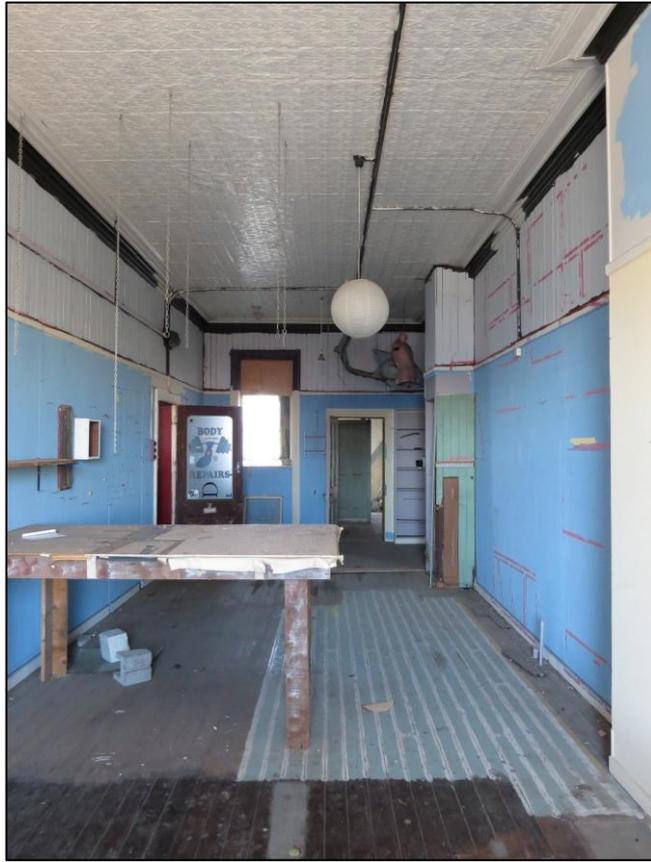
Room 34, first floor, facing east, showing timber floor, range of wall linings, joinery and pressed tin ceiling. Note boarded fireplace on right in immediate foreground. Amy McStay 29/06/2017
